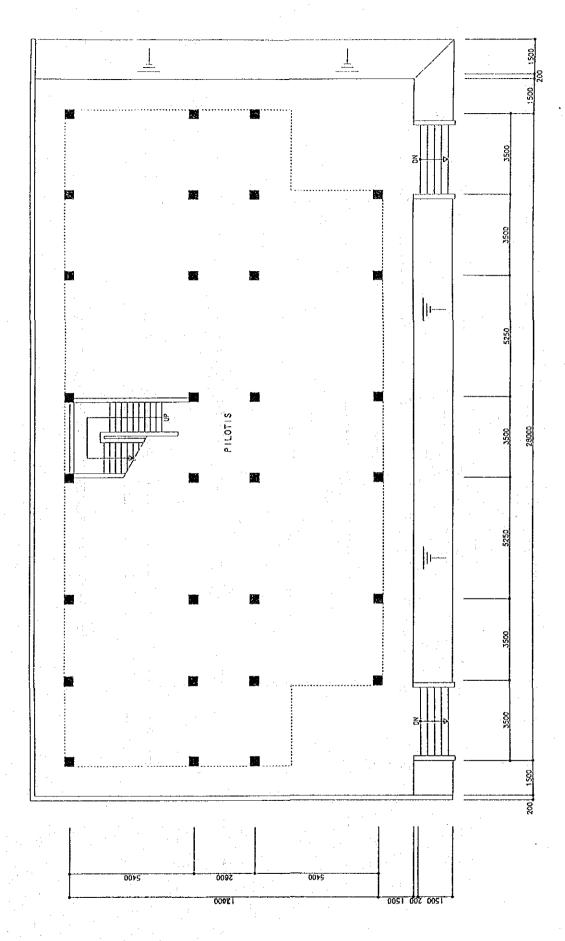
(1) GROUND FLOOR PLAN (5-CLASSROOM TYPE)
